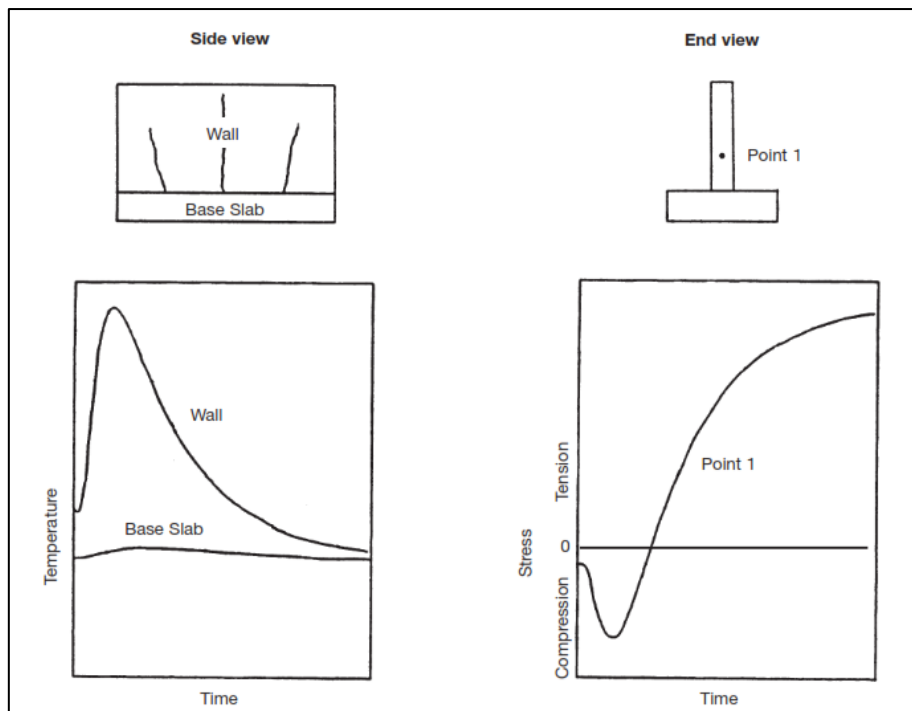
Development of stresses in a concrete wall as a result of external restraint by the previously cast base slab (Ballim & Graham, 2009)
